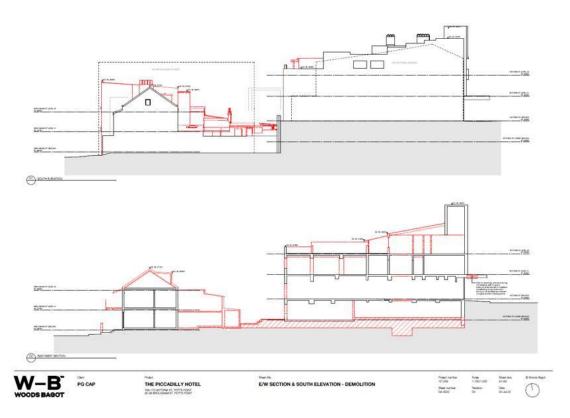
Proposed east-west section and south elevation demolition drawing extracts
